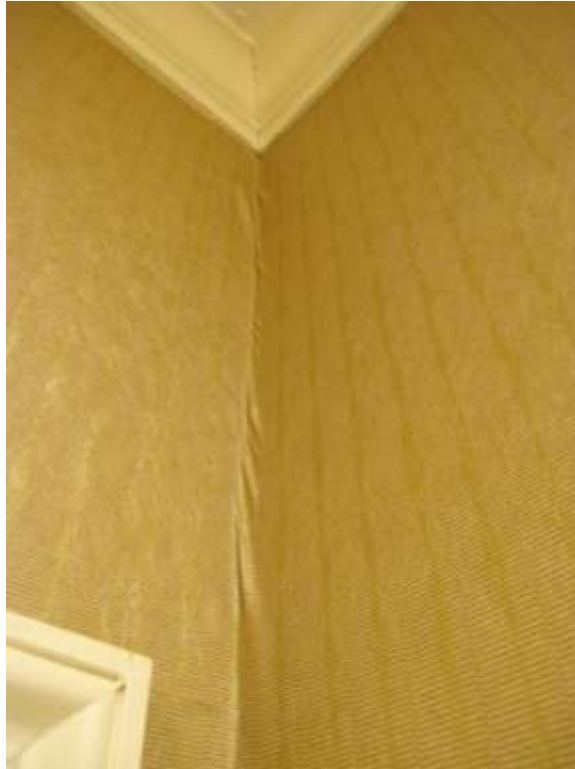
Corner separation at the bathroom opposite the cracks in the dining room wall.
